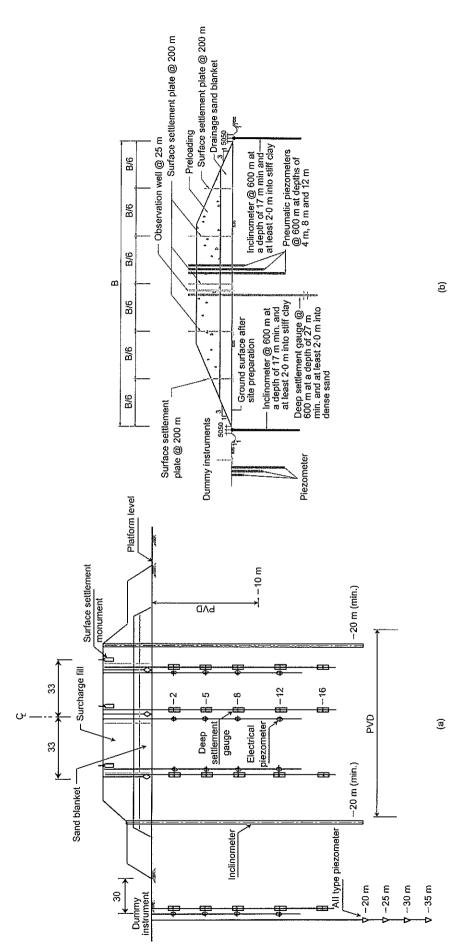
Typical cross-section of instrumentation: (a) GIAP; (b) GILRS
